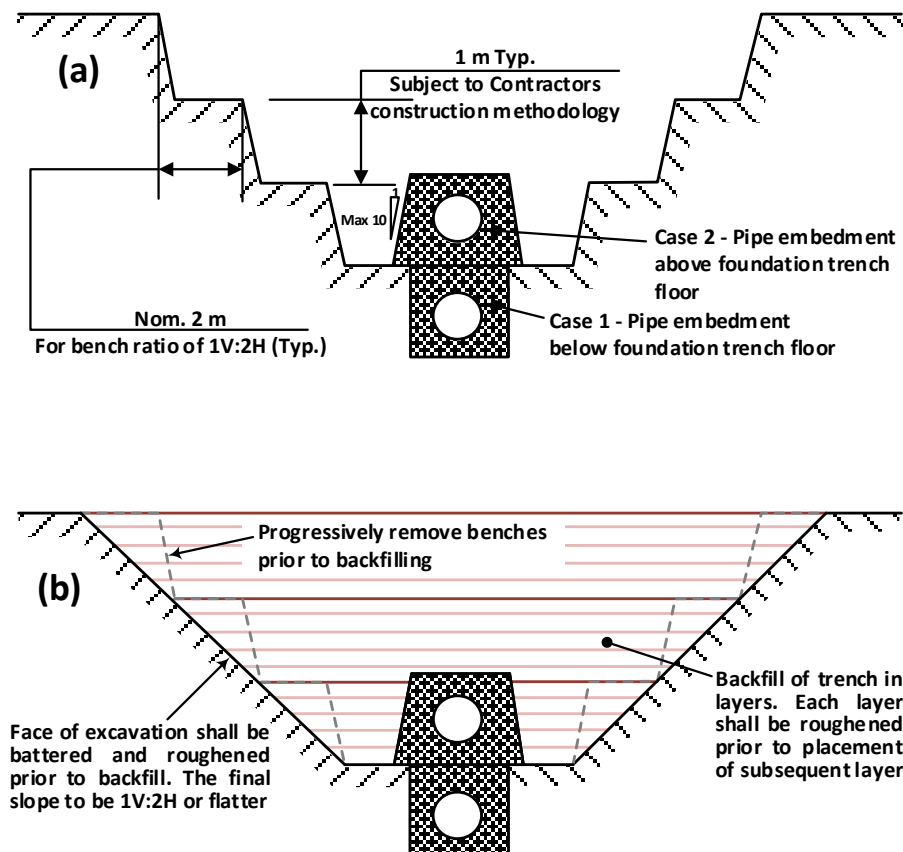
An example of (a) benched embankment excavation for pipe penetration, and (b) backfilling around and on top of the pipe embedment zone with progressive battering
